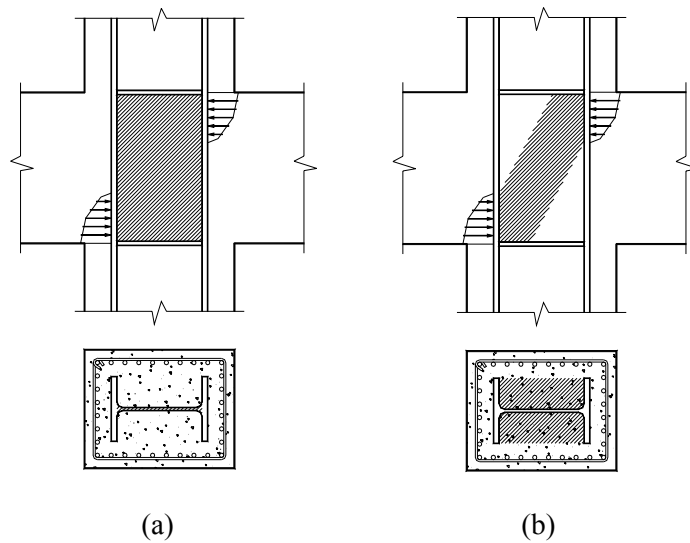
a) Steel web panel mechanism, b) concrete compression strut mechanism
